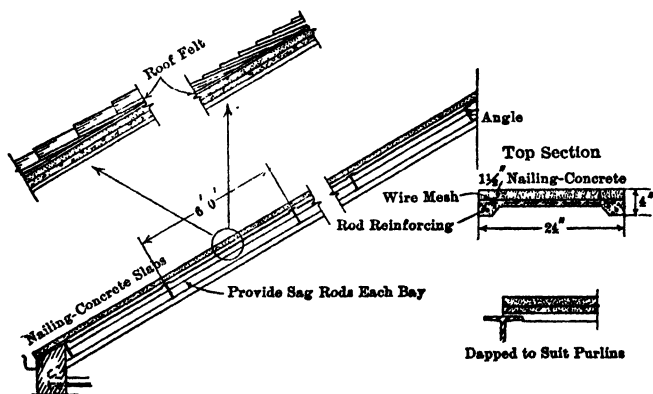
Details of Featherweight Nailing-Concrete Roof-Slabs
